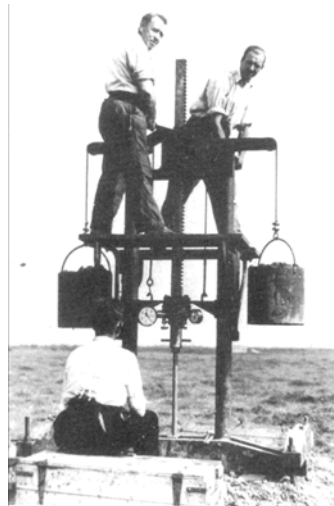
Early Dutch mechanical cone (after Delft Geotechnics)
